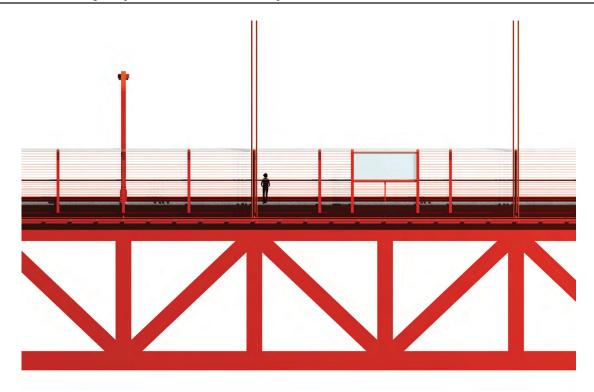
ALTERNATIVE 2A: ELEVATION AT BELVEDERE
